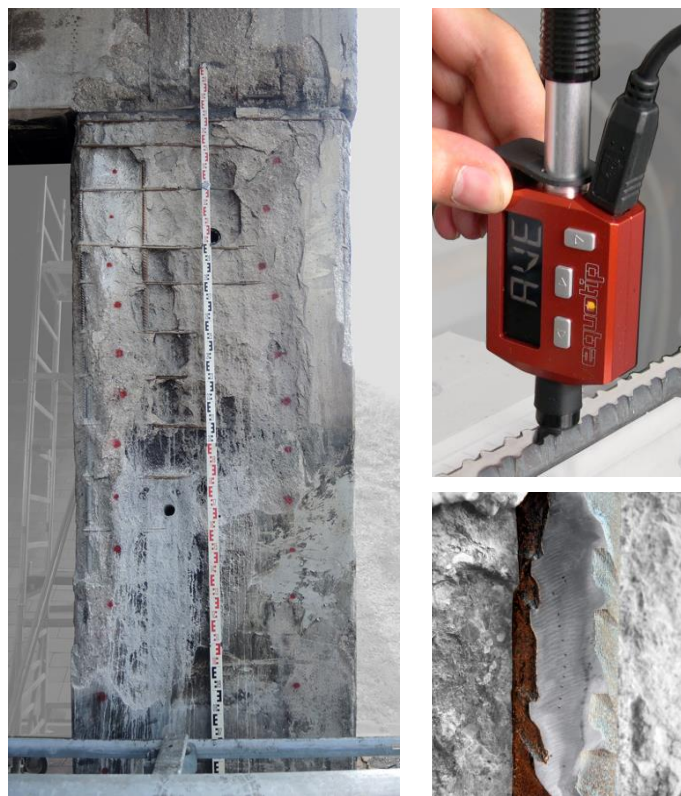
Surface spalling on one column and dynamic hardness tests on exposed rebars / Spacco superficiale su un pilastro e prove di durezza dinamica sulle barre esposte.
